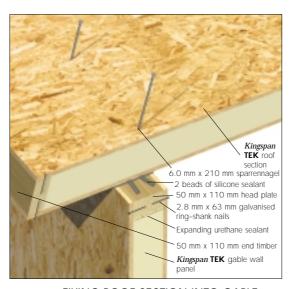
FIXING ROOF SECTION INTO GABLE WALL (OVER HANG)
